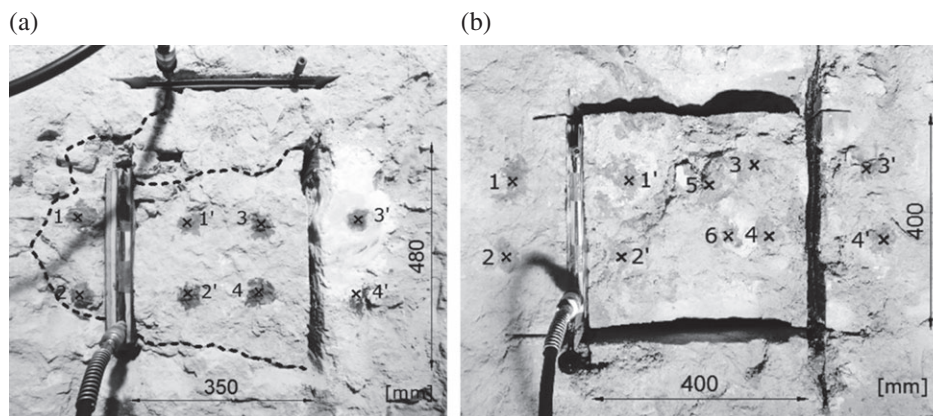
Shear tests: (a) frontal cracks on the masonry at the end of the test P.2; (b) setup of test P.3.
